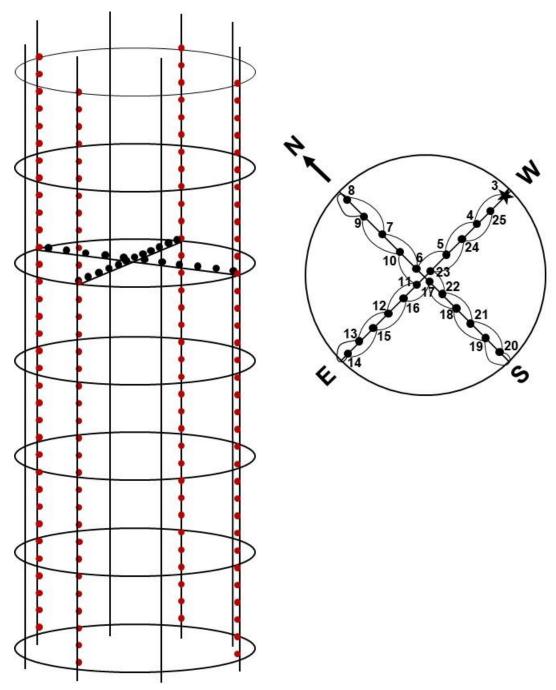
Sinclair Hills drilled shaft thermal sensor layout schematic.
